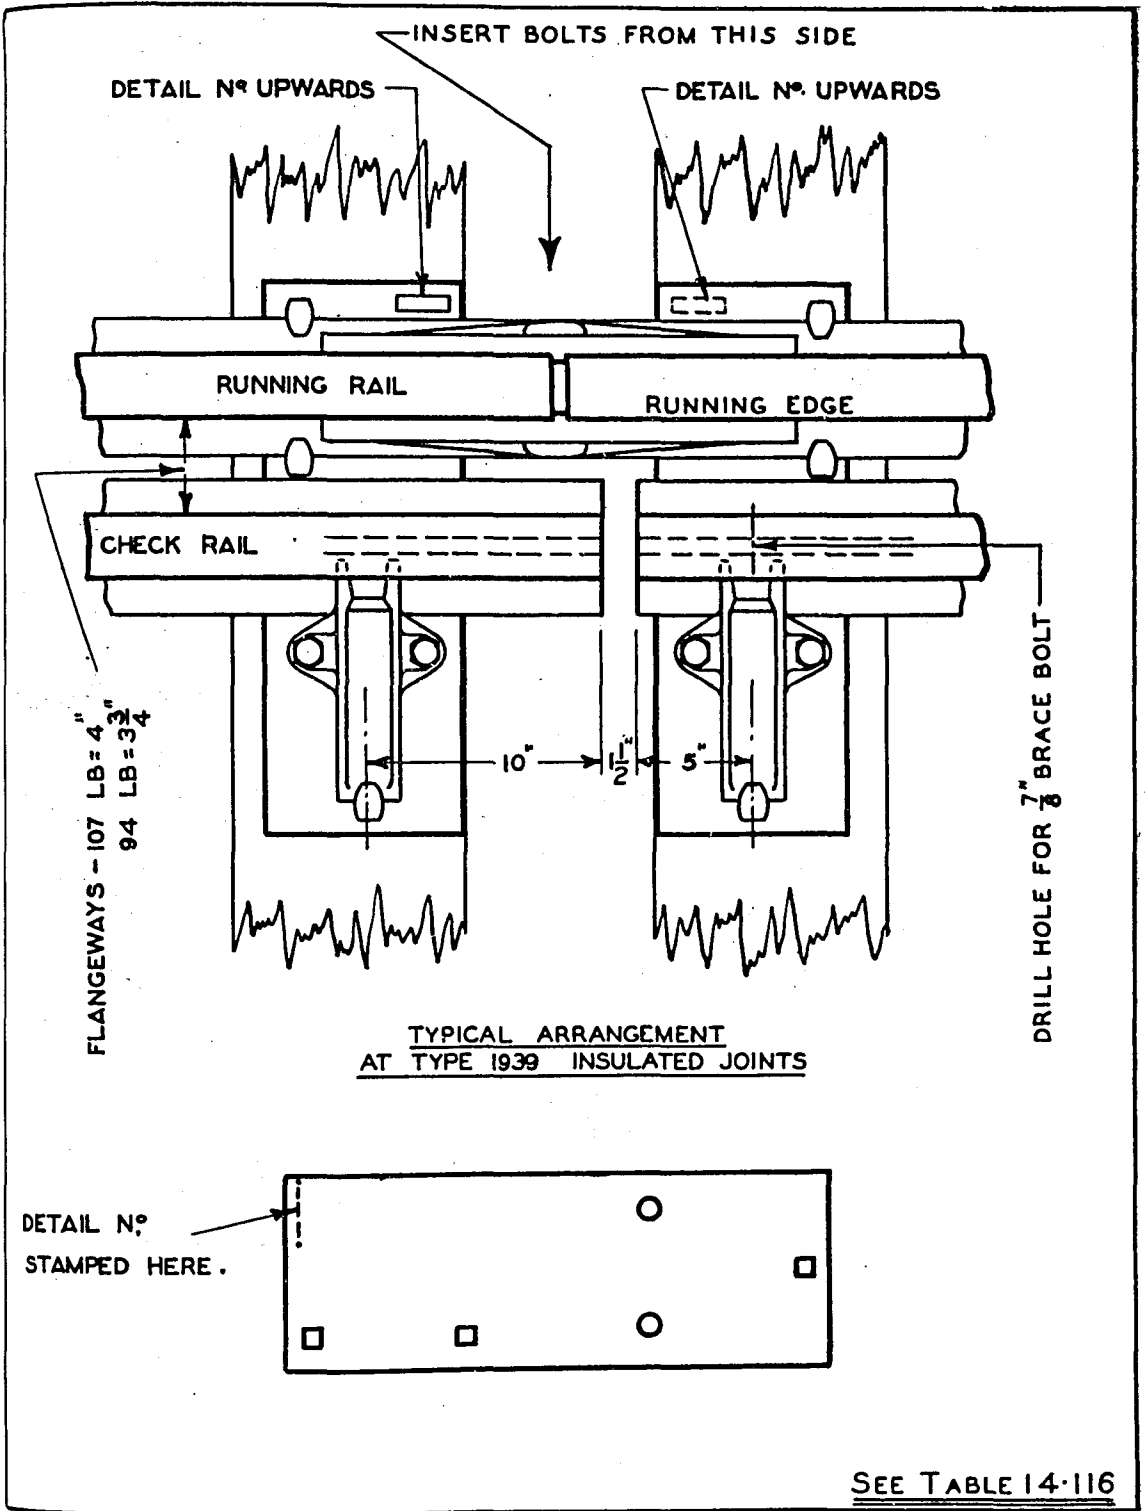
CHECK RAIL GAUGE PLATES FOR TYPE 1939 INSULATED JOINTS.1007.AND.1008.
